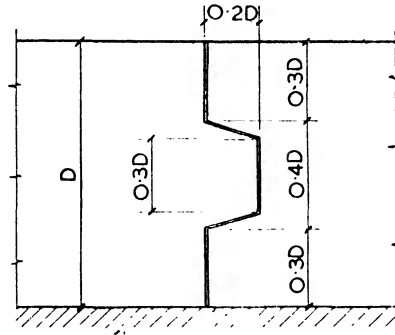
TONGUE-AND-GROOVE JOINT.
